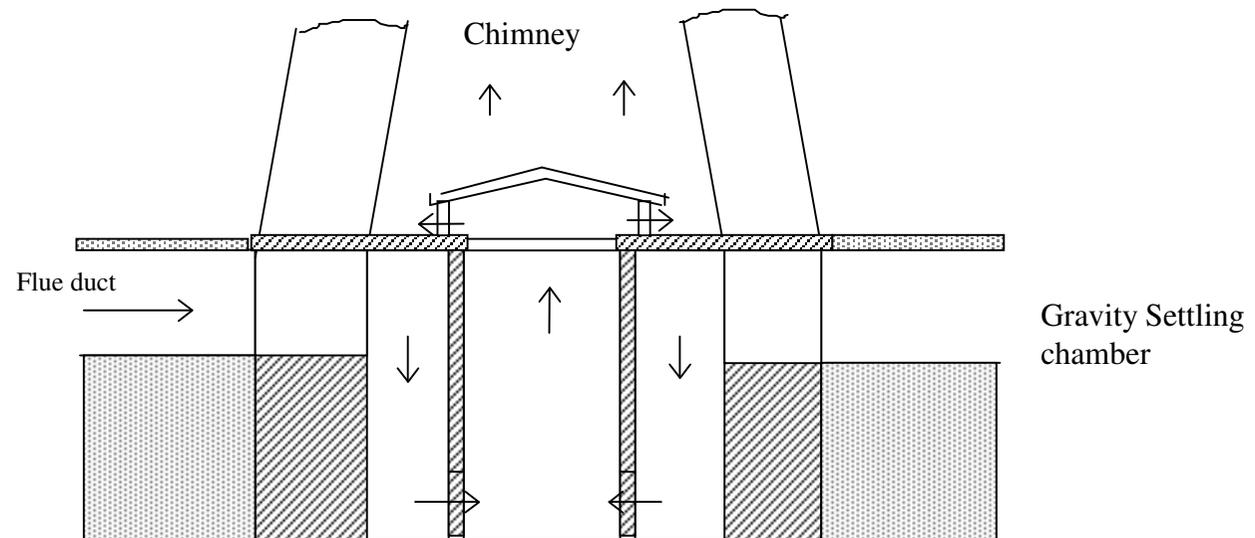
Schematic Plan and details of gravity settling chamber of Priya/PSCST fixed chimney kiln
